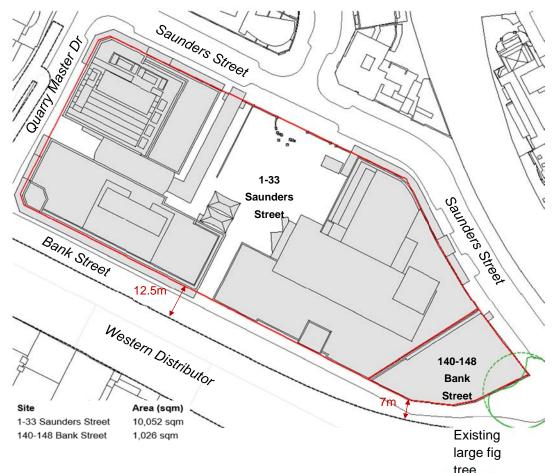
existing site plan for 1-33 Saunders Street & 140-148 Bank Street
